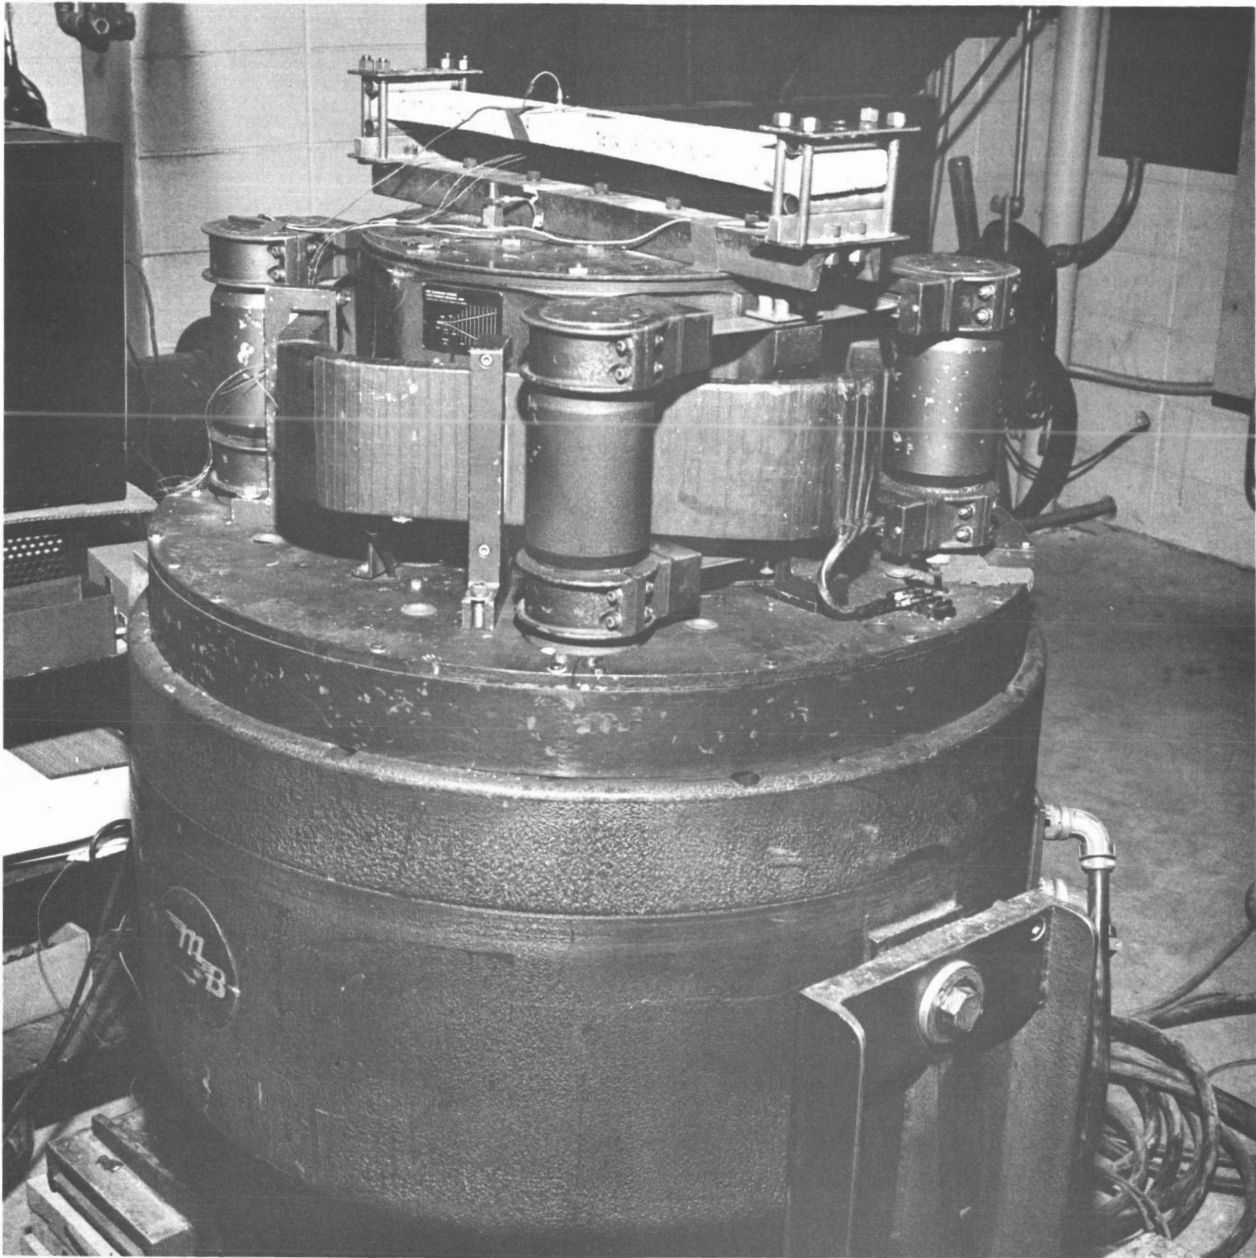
Dynamic Testing of a Concrete Beam Mounted on a MB C-25 HH Vibrator
